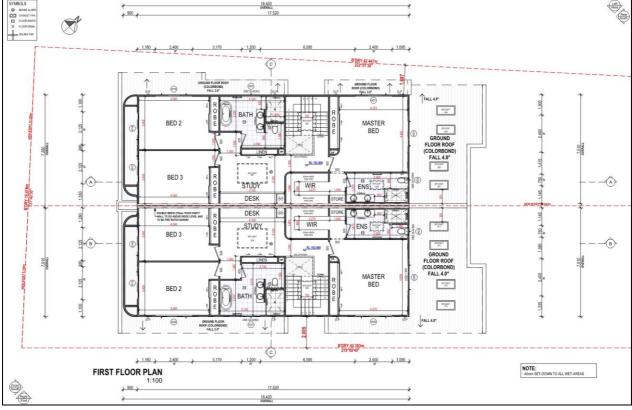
Proposed First Floor Plan (Source: VD&D, 2025)
